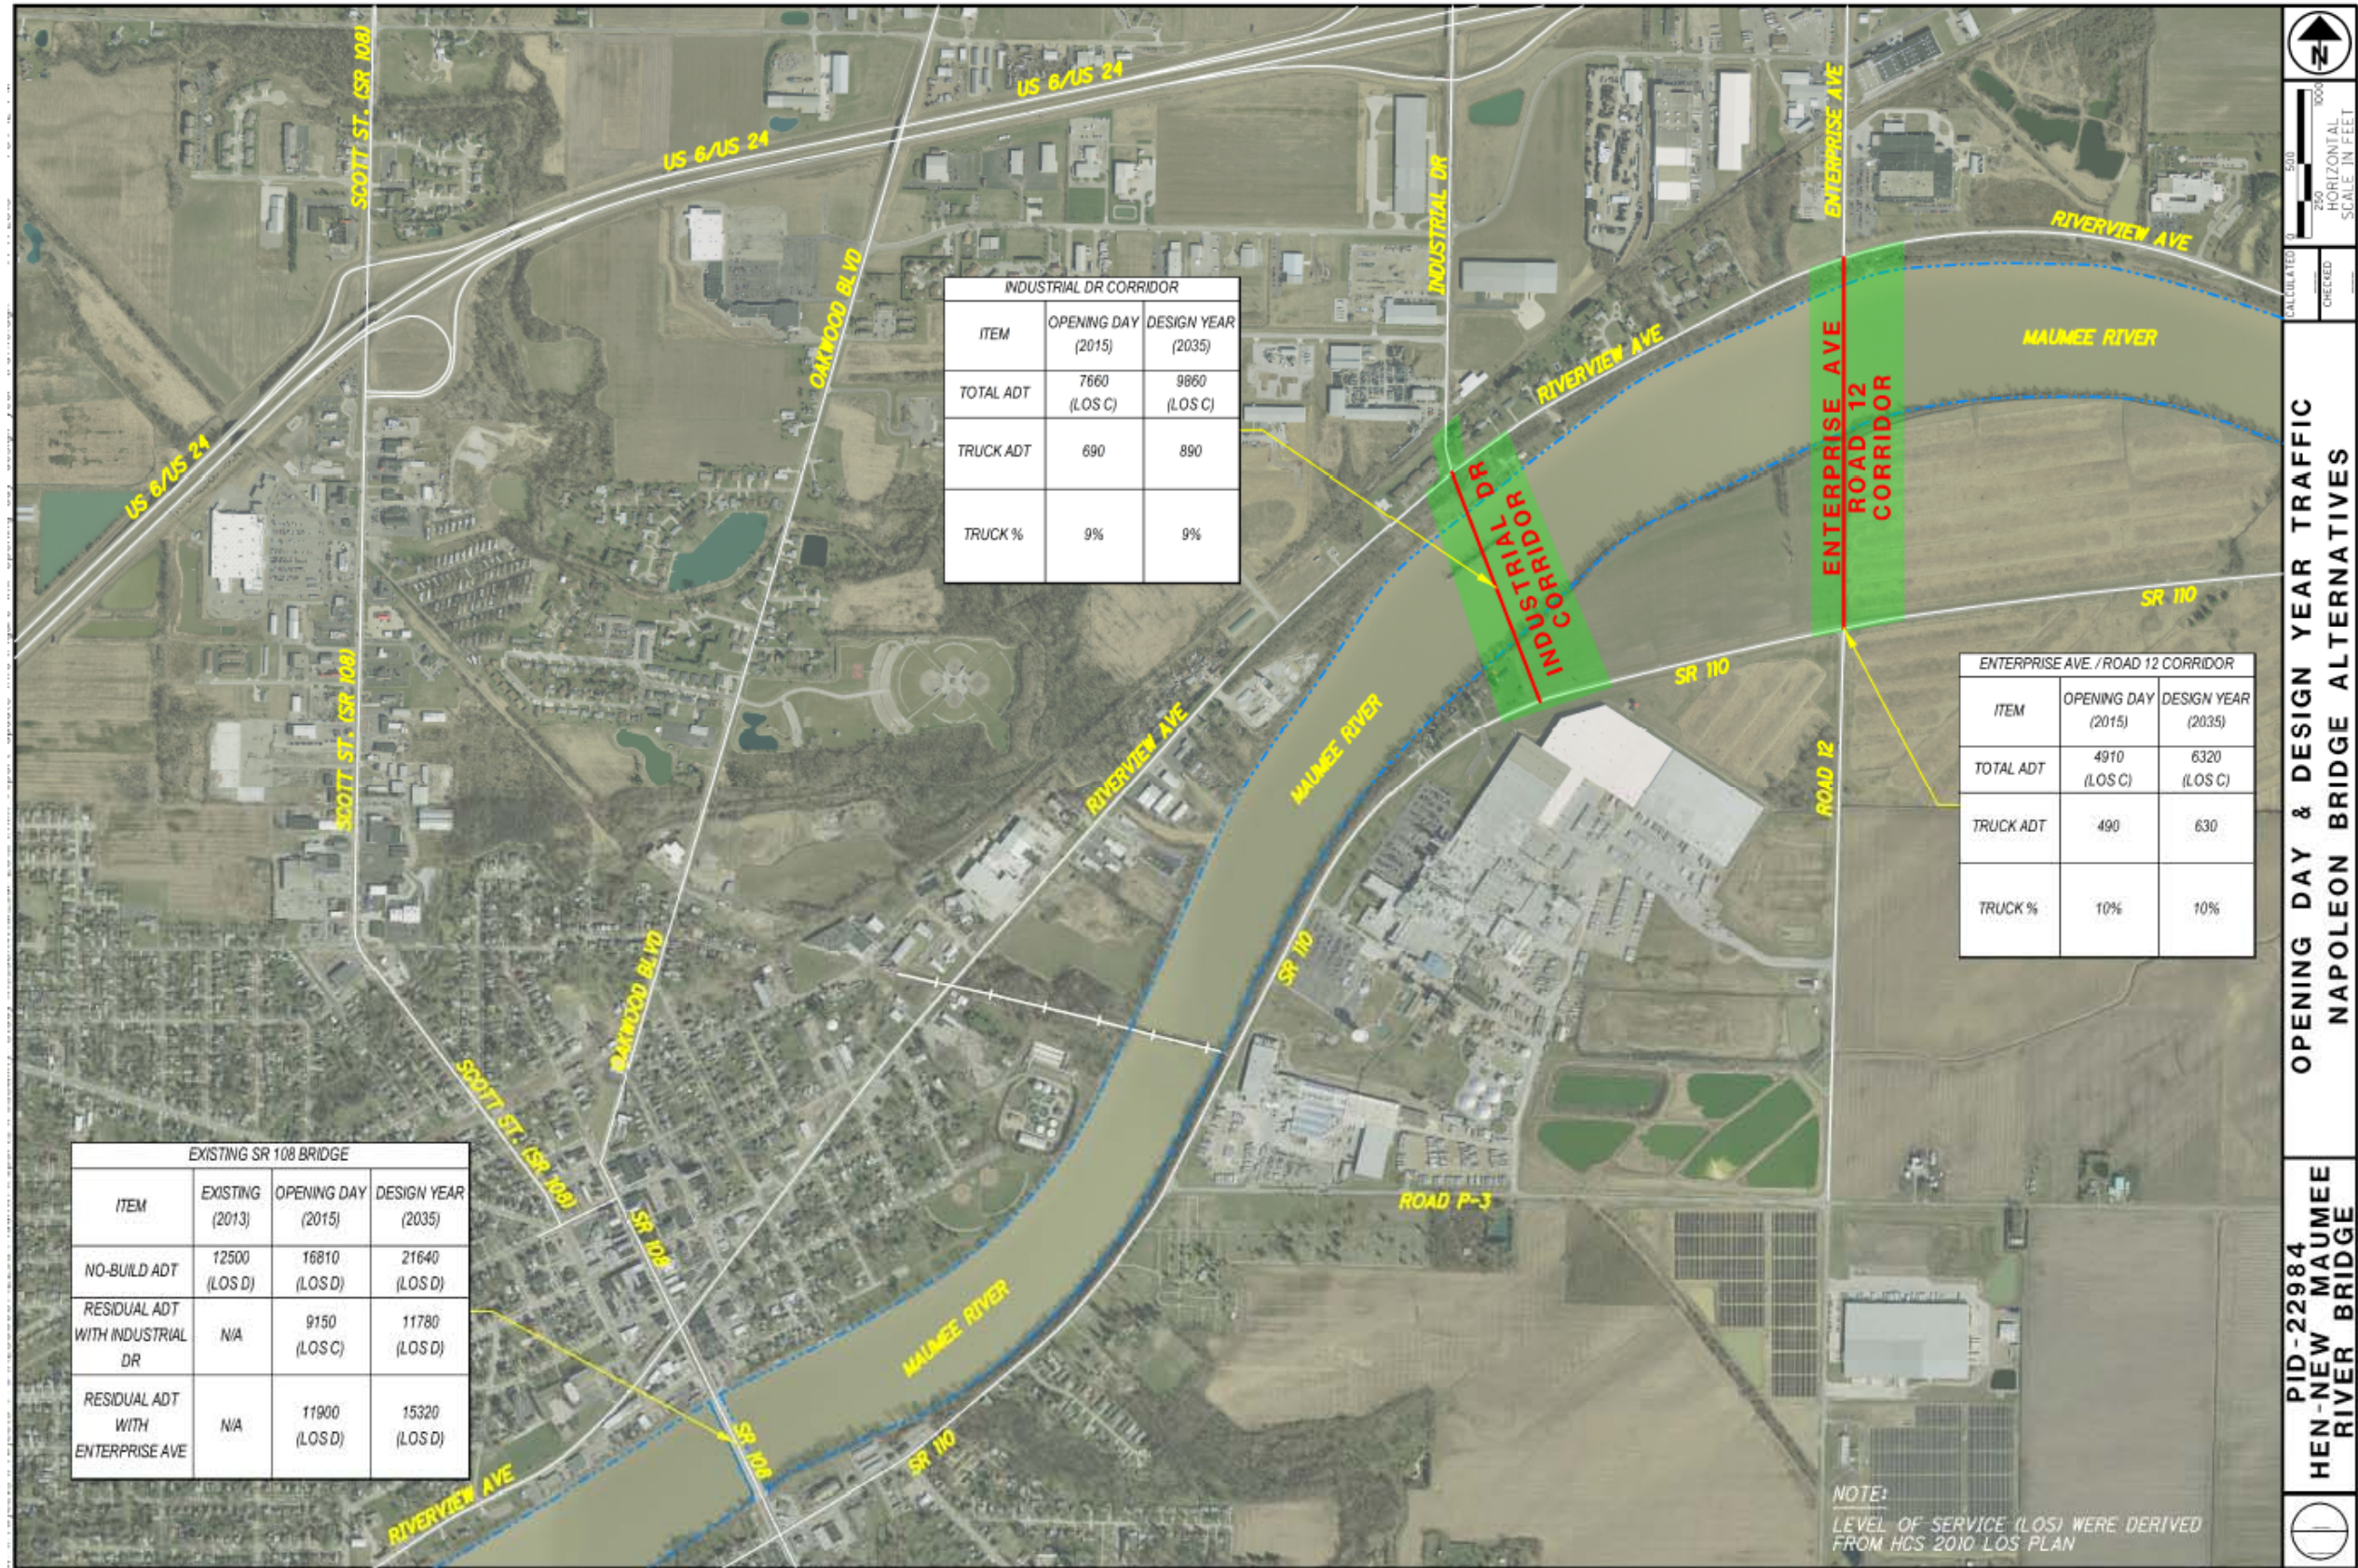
Opening Day & Design Year Traffic for Bridge Alternatives
